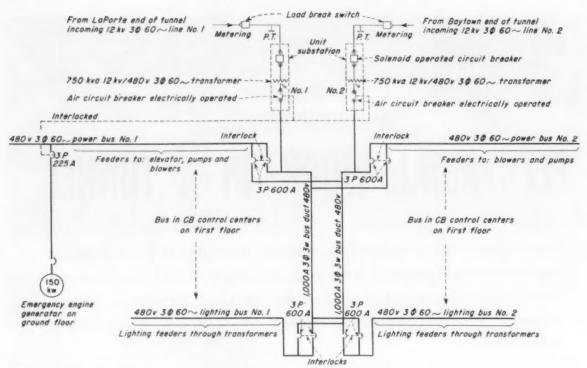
Single-line diagram shows basic arrangement of substations and feeder control centers.
